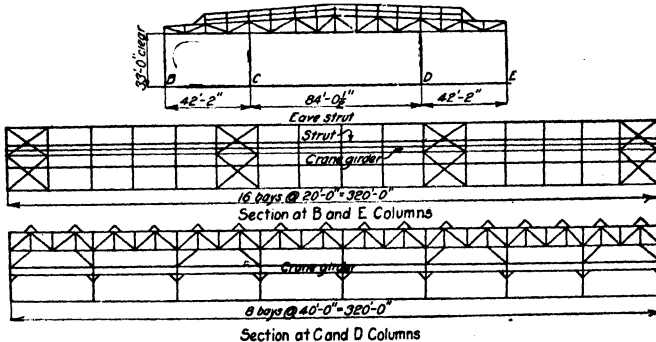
Longitudinal and transverse sections through machine shop shown in Fig. 91.
